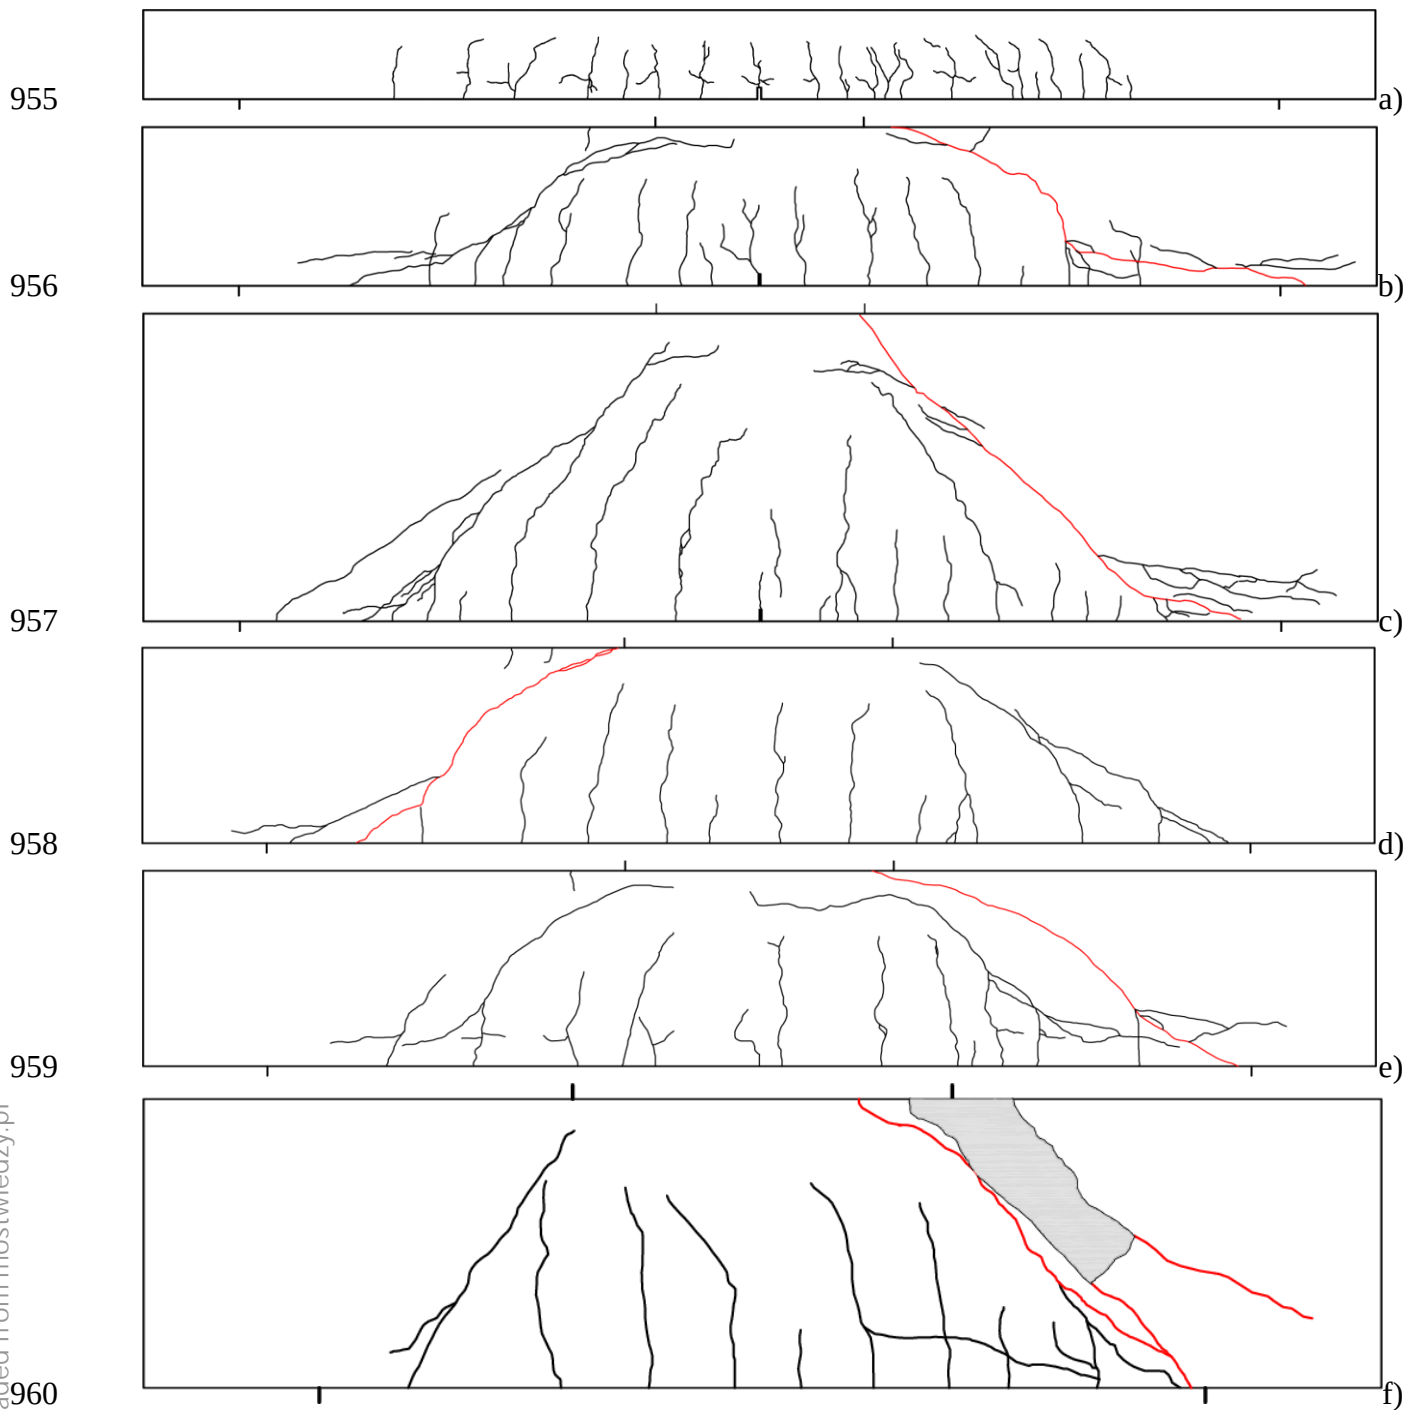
Crack pattern at failure typical for each beam geometry depending upon ratio a/D for different failure mode: a) reinforcement yielding ($\eta_a=6$), b) shear failure mode in concrete (diagonal tension) with ($\eta_a=3$), c) shear failure in concrete (diagonal shear-compression) ($\eta_a=1.5$), d) shear failure in concrete (diagonal tension) ($\eta_a=2$), e) shear failure in concrete (diagonal shear-compression) ($\eta_a=2$) and f) shear failure in concrete (diagonal shear-compression) ($\eta_a=1$) (critical diagonal crack marked in red, beams are not proportionally scaled) [20]
